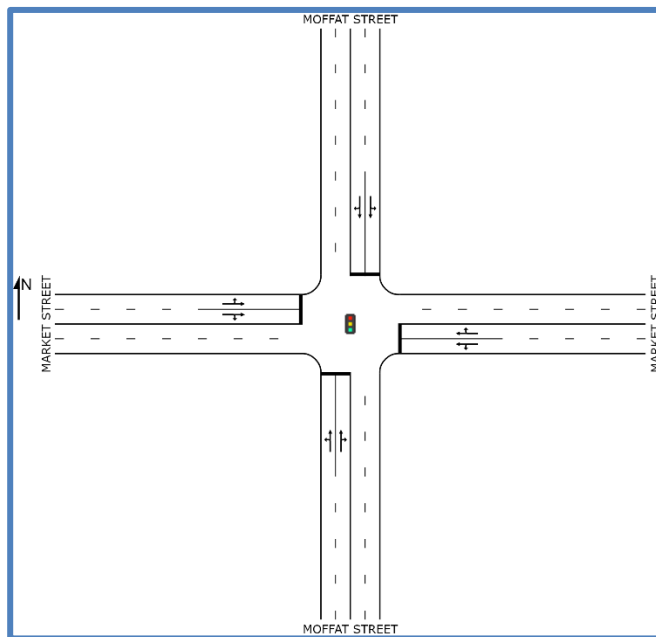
Existing layout of Market Street (N14) and Moffat Street (N18) intersection
